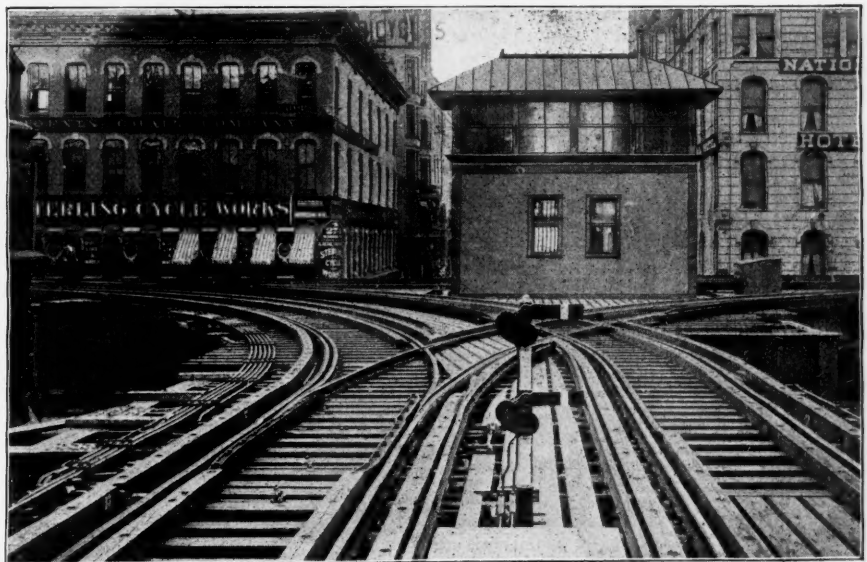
South Side Junction, Union Elevated Railroad, Chicago.
